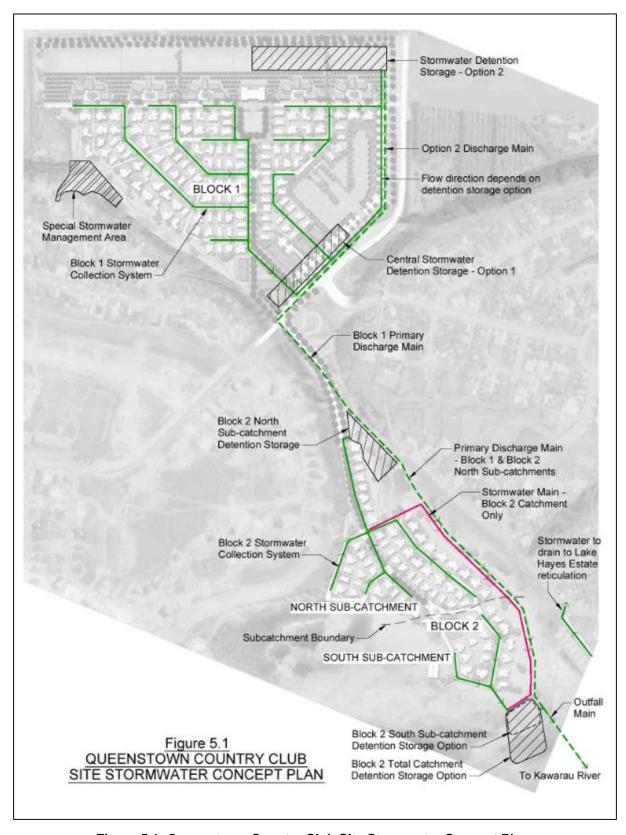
Queenstown Country Club Site Stormwater Concept Plan
